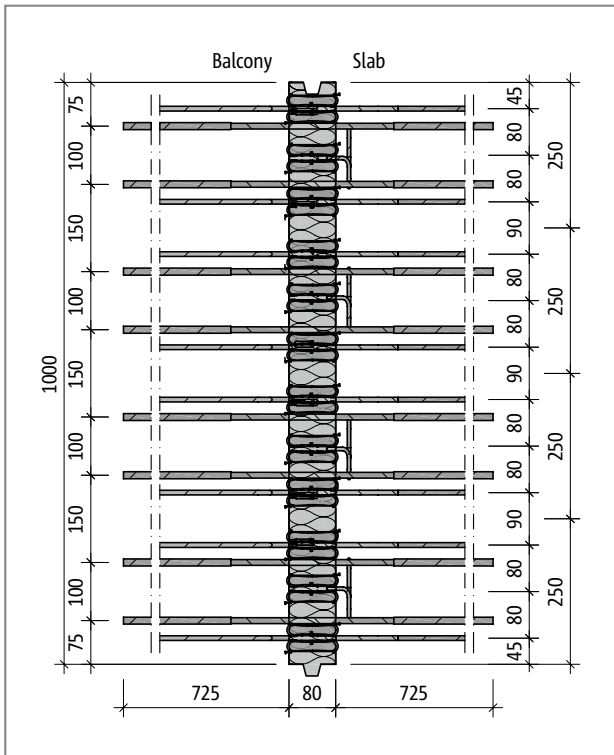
Schöck Isokorb® T type K-E-M6: Product layout
